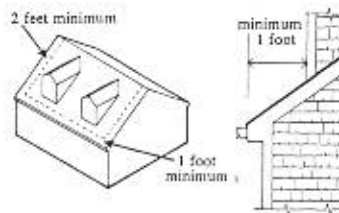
Dormers should be set back at least 1 foot from the roof edge, 2 feet from either gable end.
